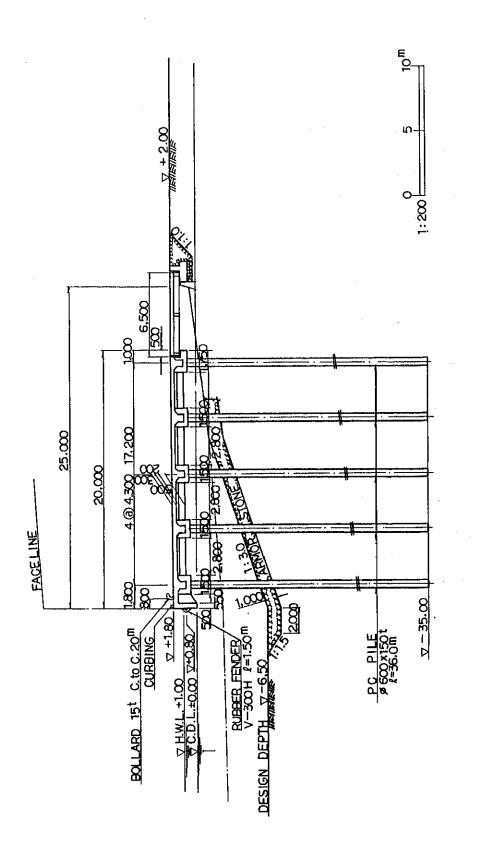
Design of Type-D (P.C. Pile)
